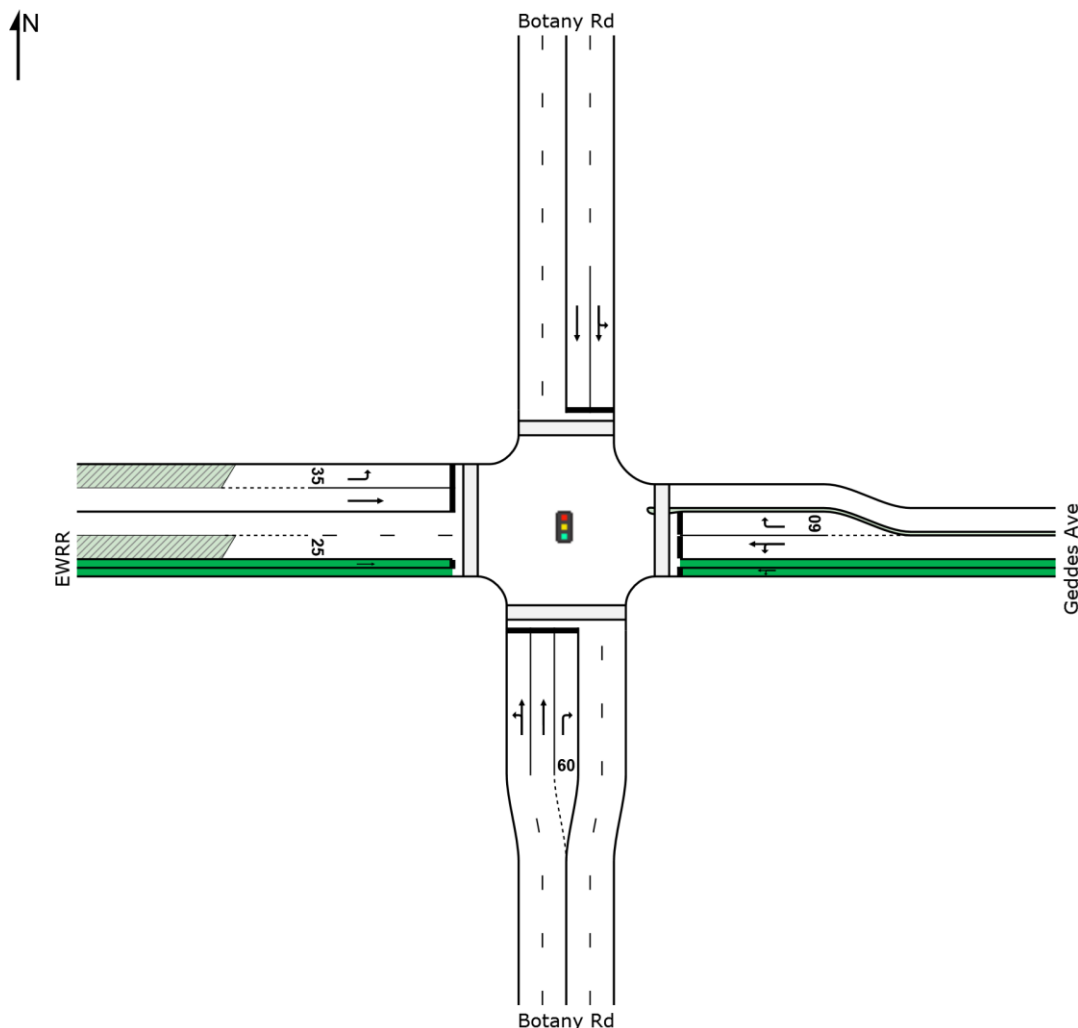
Proposed Intersection of Botany Road | GS2AC
